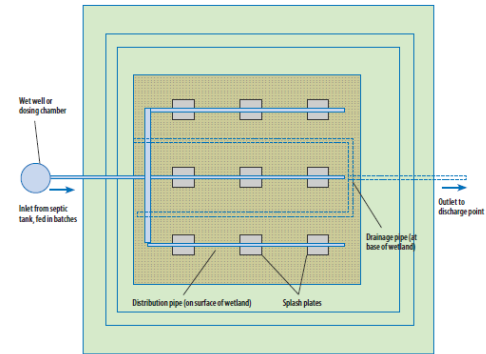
Typical plan view of a vertical flow constructed wetland prior to planting
